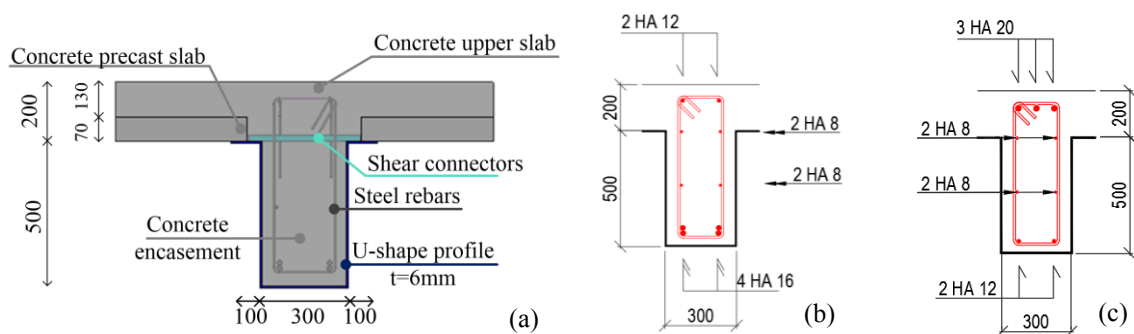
UCSB - (a) Cross section. (b) Reinforcement bars of central part. (c) Reinforcement bars of outer parts.
